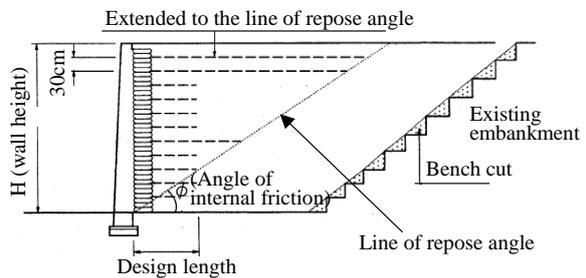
Arrangement when the embankment width is wider than ordinary conditions
